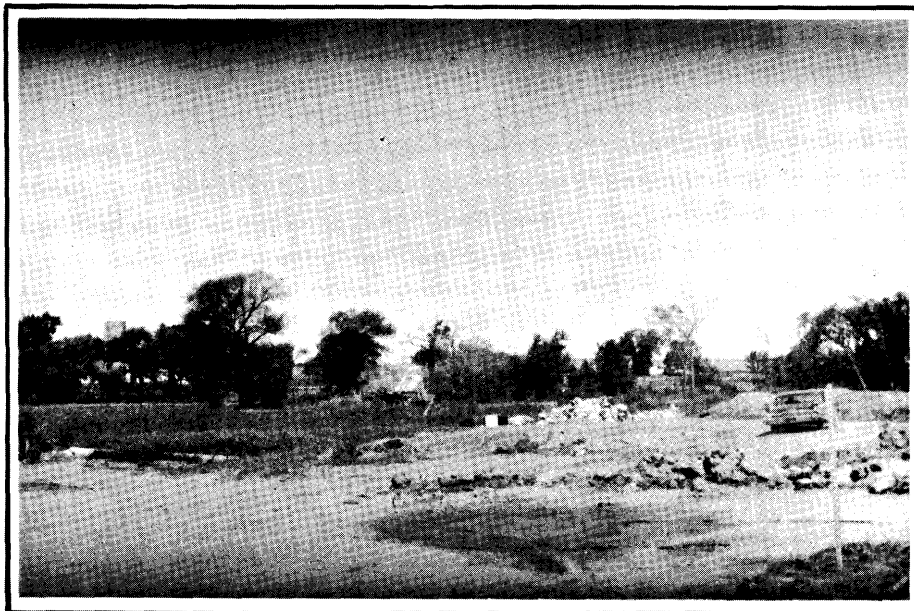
Looking Northwest at city flood plain fill area Southeast of Indian Creek about 500 feet above the junction with Dry Creek. Fill area about to be closed and shaped into a City Park at Mile 11.25.
